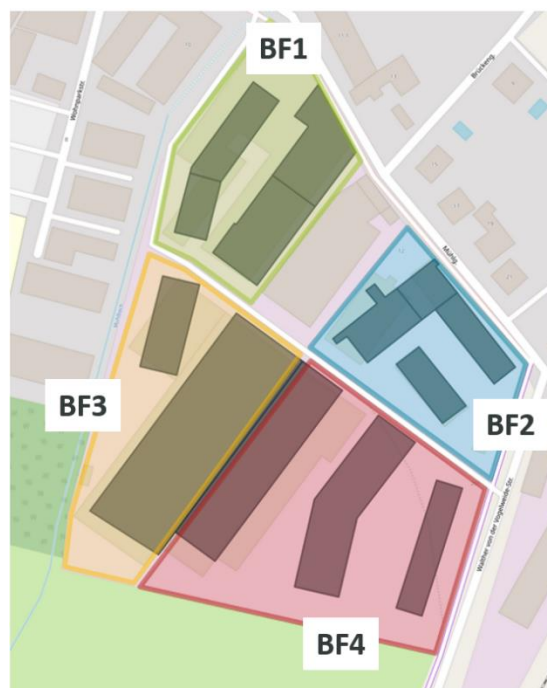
Site plan of Werk Möllersdorf. Source: e7
